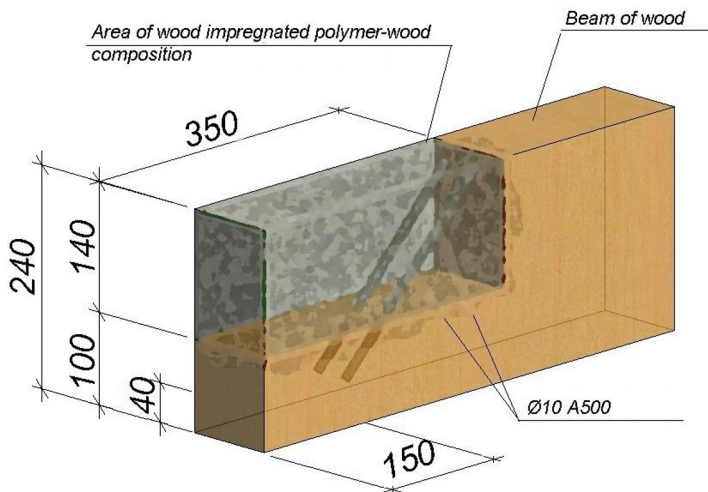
Method for restoring destructed supporting sections on example of wooden beam
